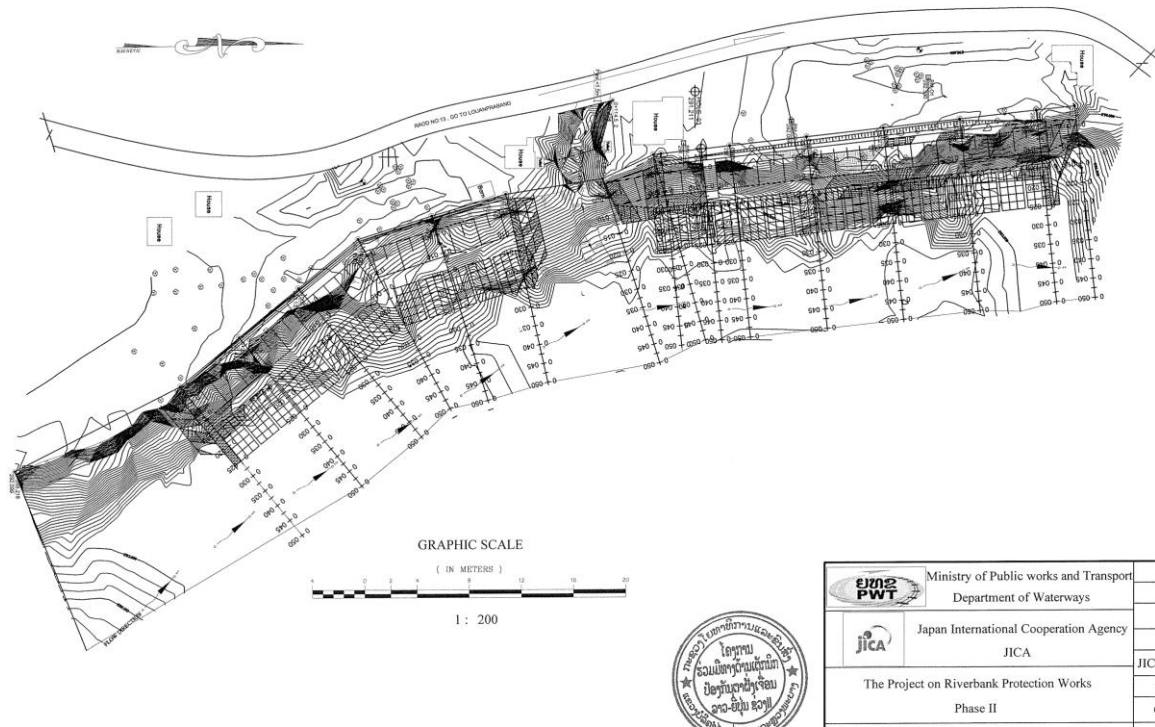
Layout of Riverbank Protection Works at Souanlouang (Nasa) Site
